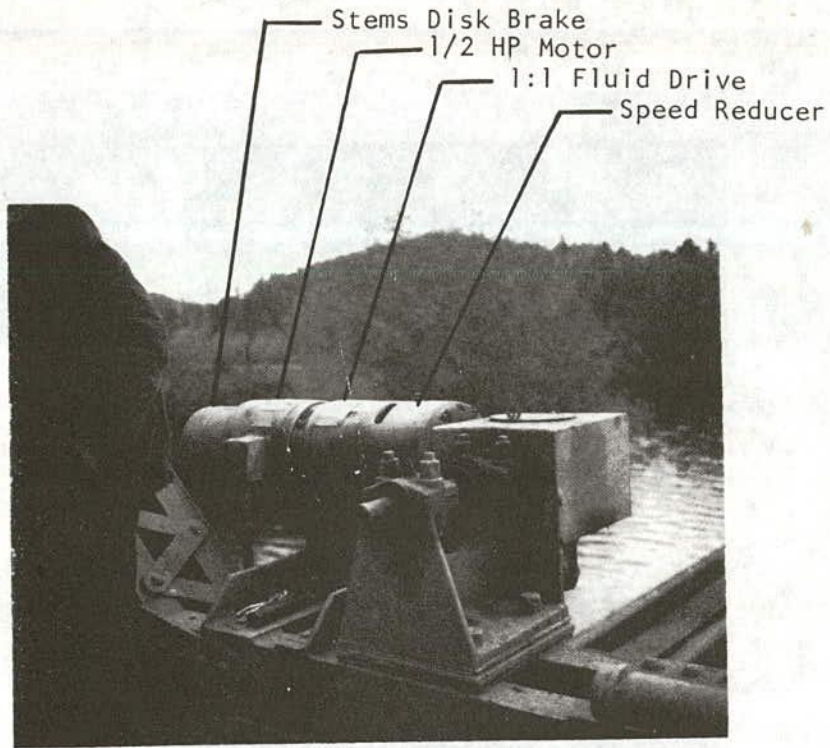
Centerlock Drive End Lock Similar Except 2 HP Motor Used
